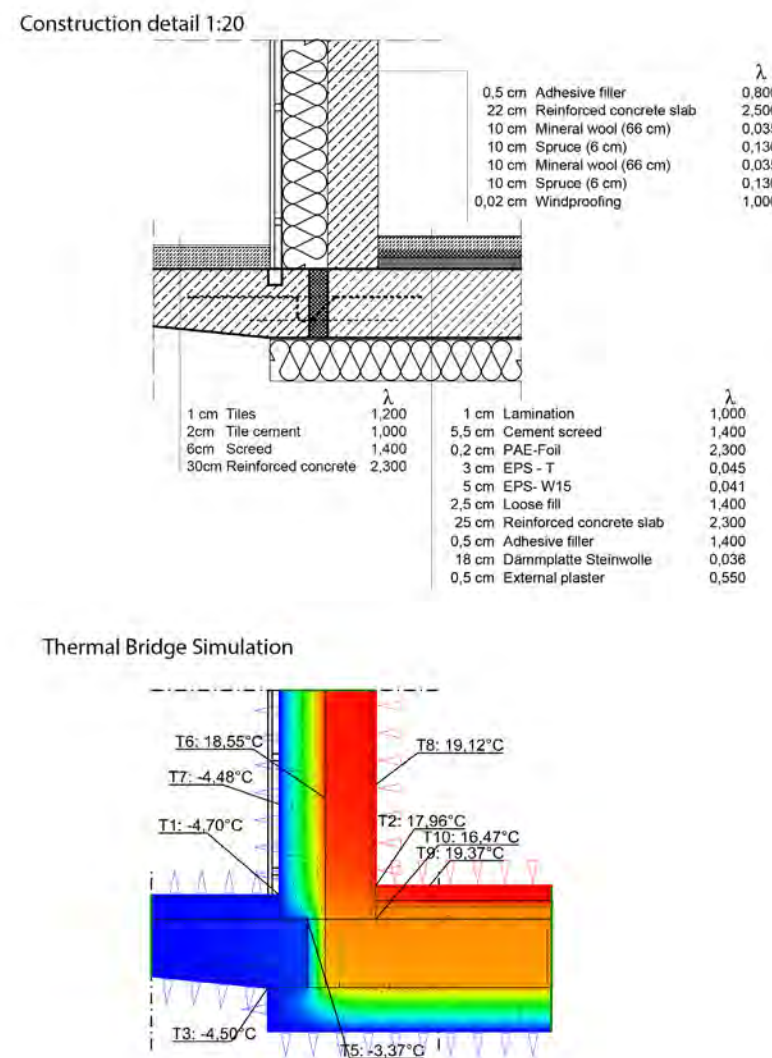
Thermal Bridge Simulation showing the connection between the foundation slab and the external wall, made by the author.
